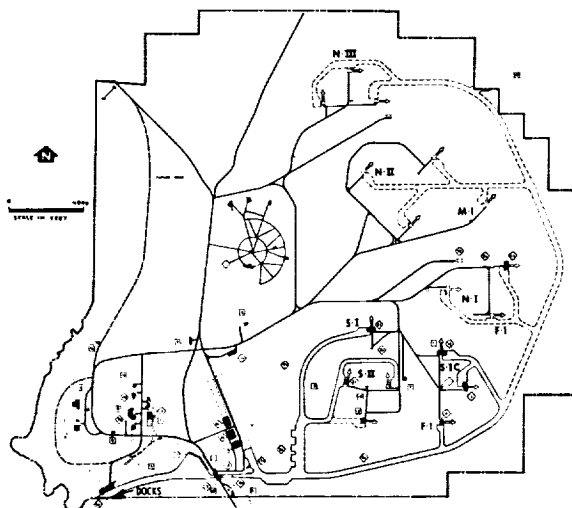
Site plan for Mississippi Test Facility.
